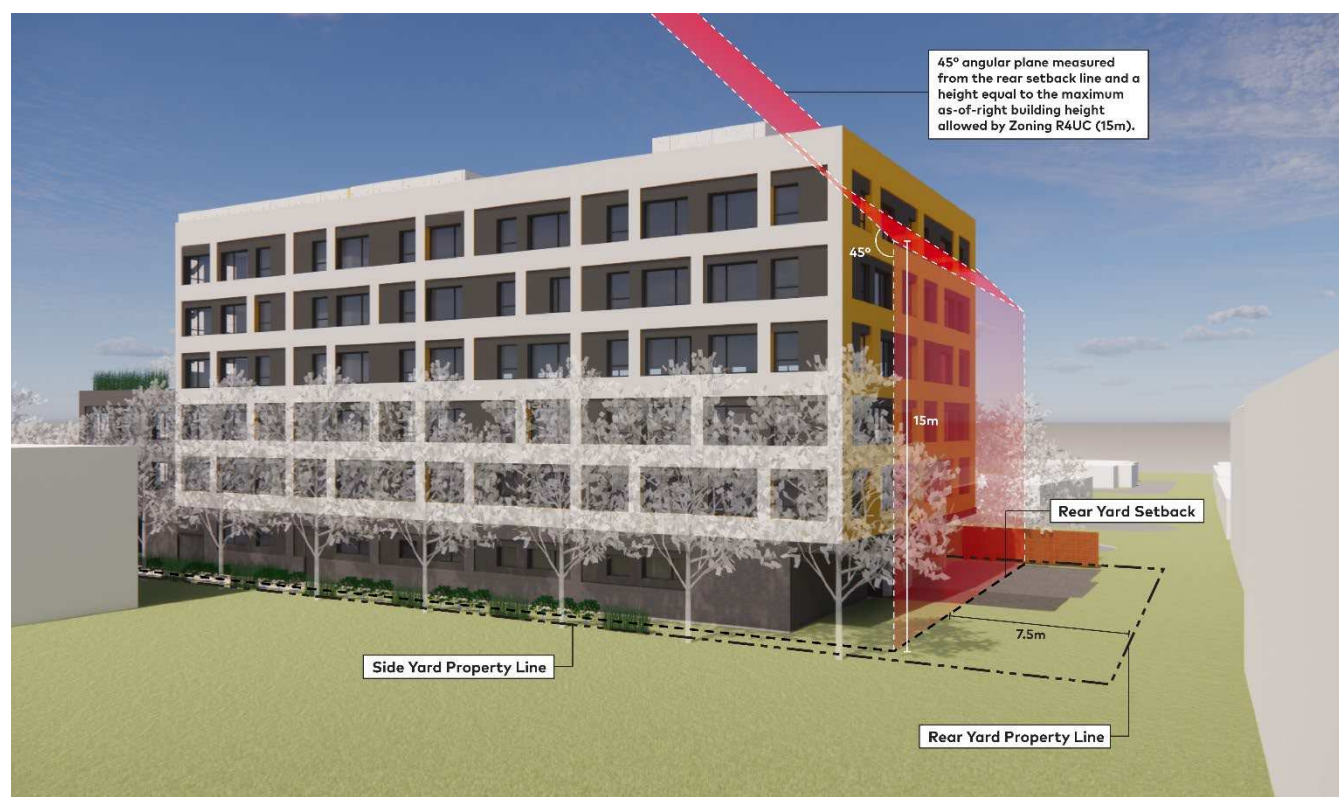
Angular plane showing impact on townhouse dwellings to the rear of the subject property with existing adjacent building envelopes.
